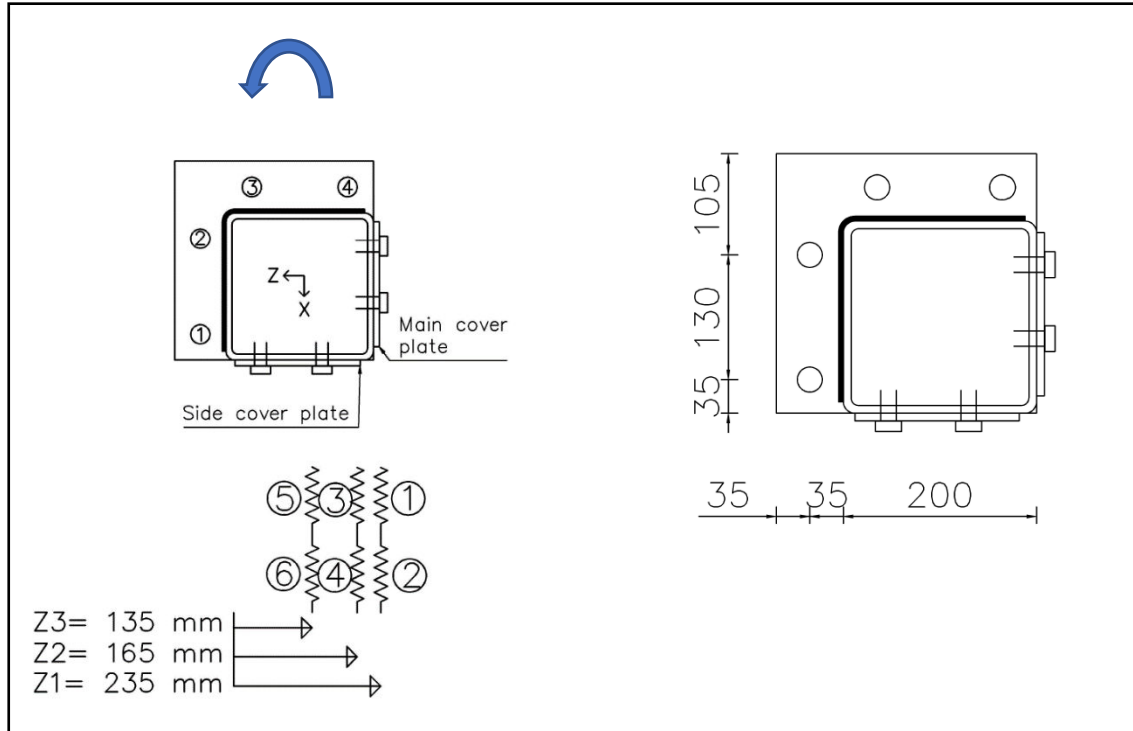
Plan and elevation of specimen CC-1 (case 2)
